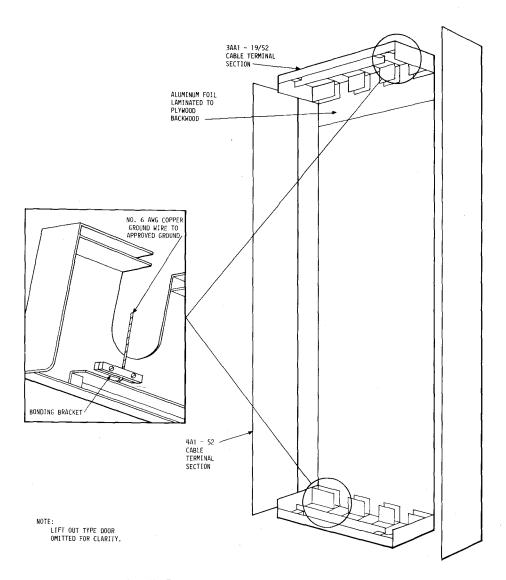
Bonding of Multiple 3A-Type Cable Terminal Sections
